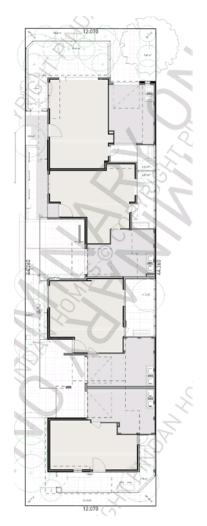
157 Loftus Street, Leederville Proposed Site
